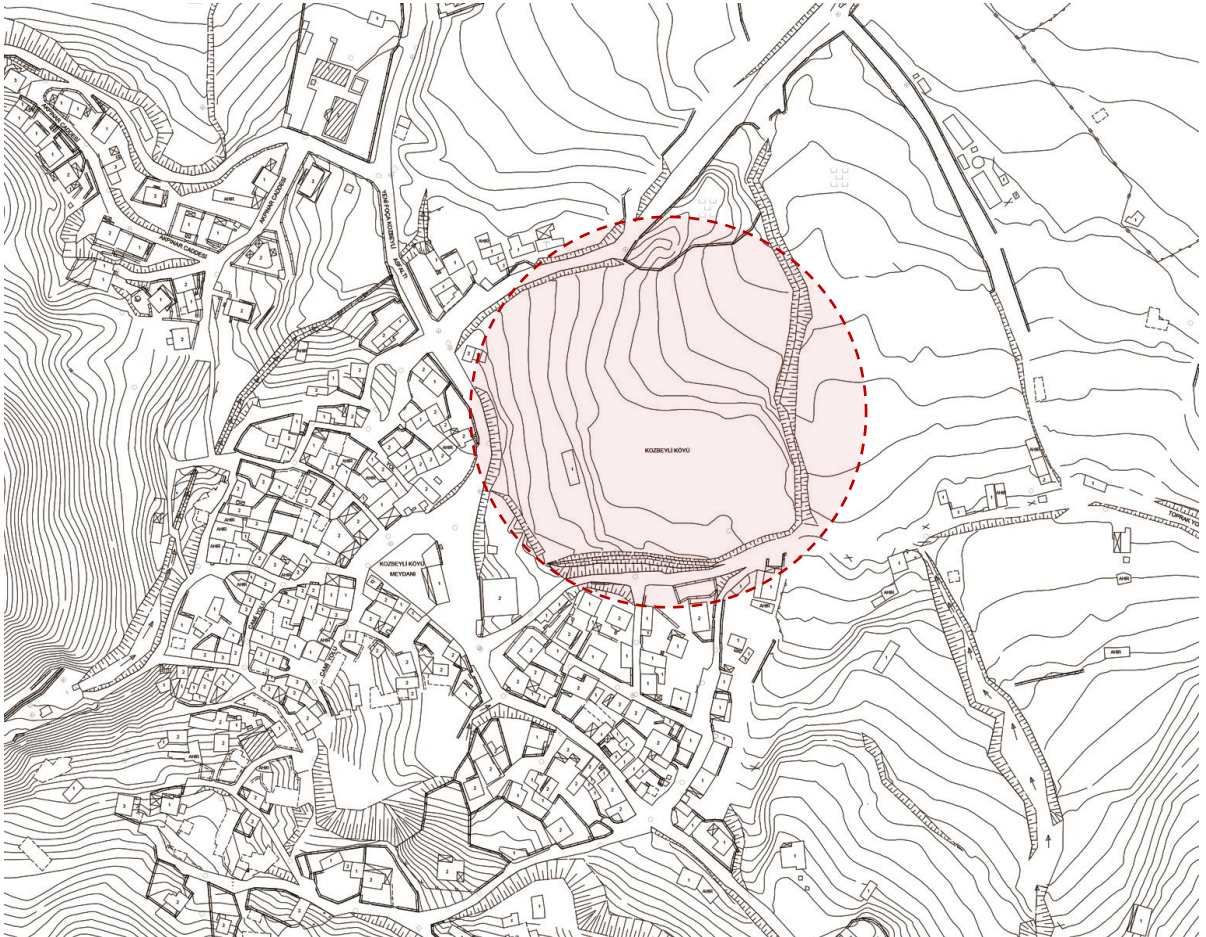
Kozbeyli Village Site Plan and Study Area (Source: Foça Municipality)
